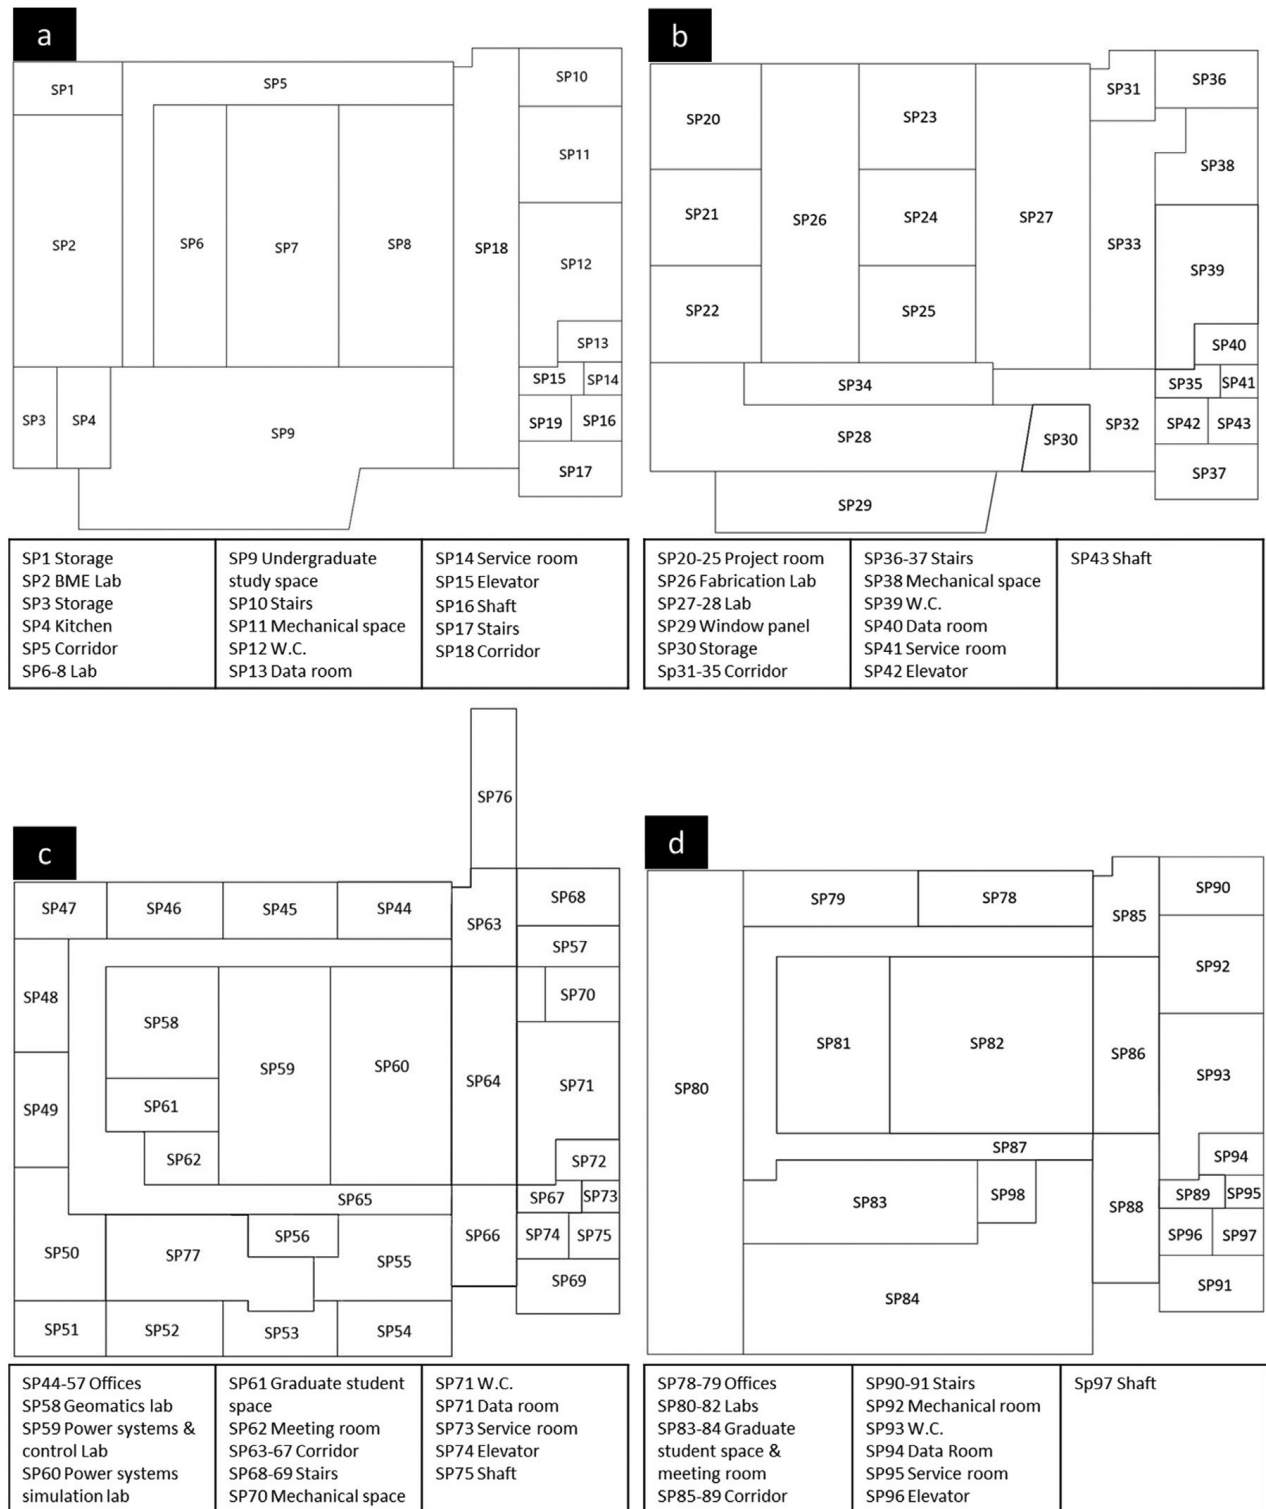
Thermal zones of the Stanley Pauley Engineering Building (SPEB): (a) Basement, (b) First Floor, (c) Second Floor, and (d) Third Floor
